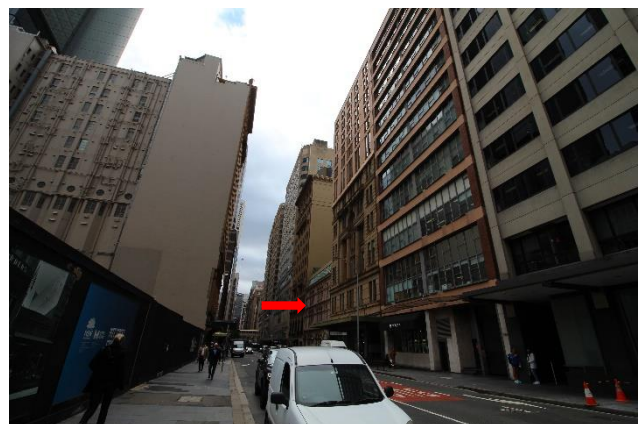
Looking north along Castlereagh Street from its intersection with Park Street, with the Pitt Street North Metro Station at the left.
